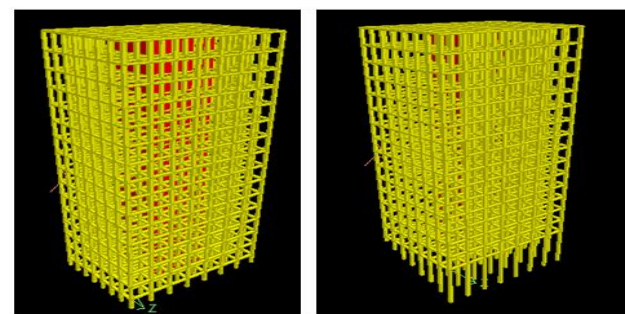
Building with C shape shear wall on plain and sloping ground.
